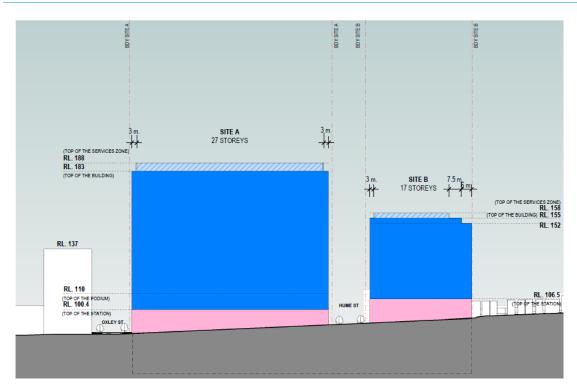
Proposed Crows Nest OSD building envelopes - west elevation (Pacific Highway)
